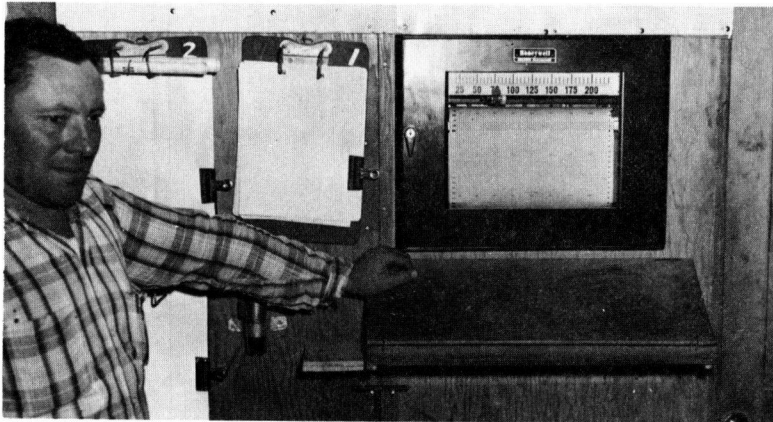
Instruction board where detailed instructions covering all anticipated steam curing situations are posted.
